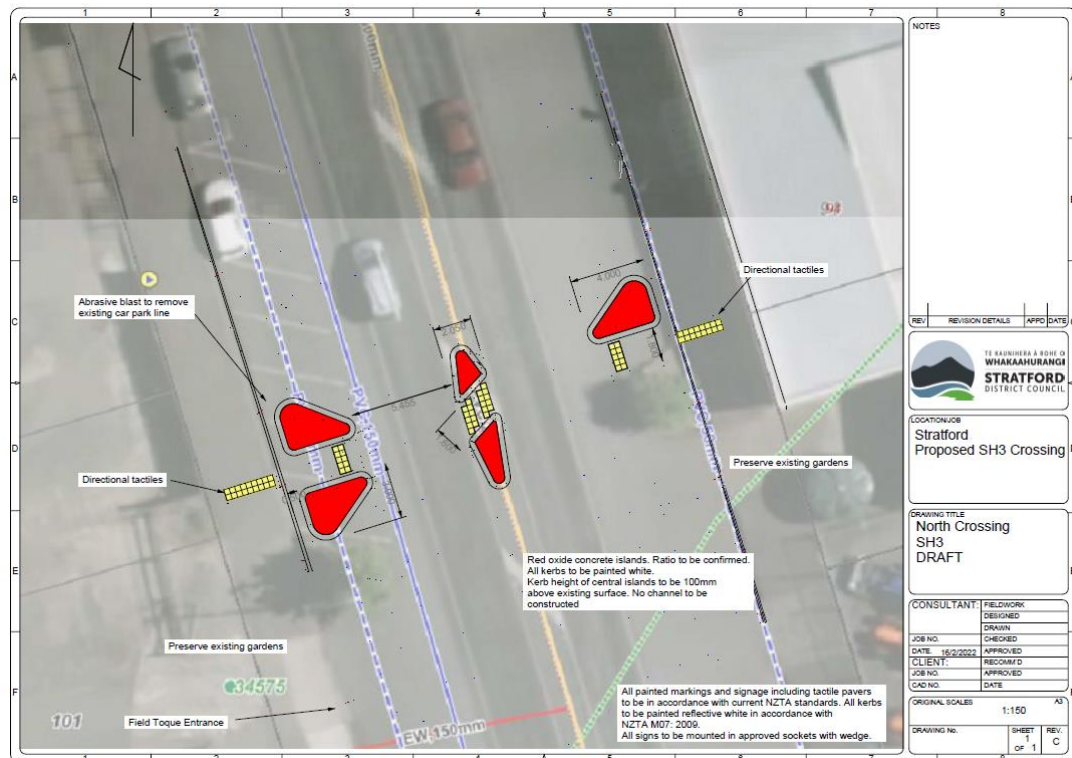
Crossing facility north of the northern roundabout on SH3.
